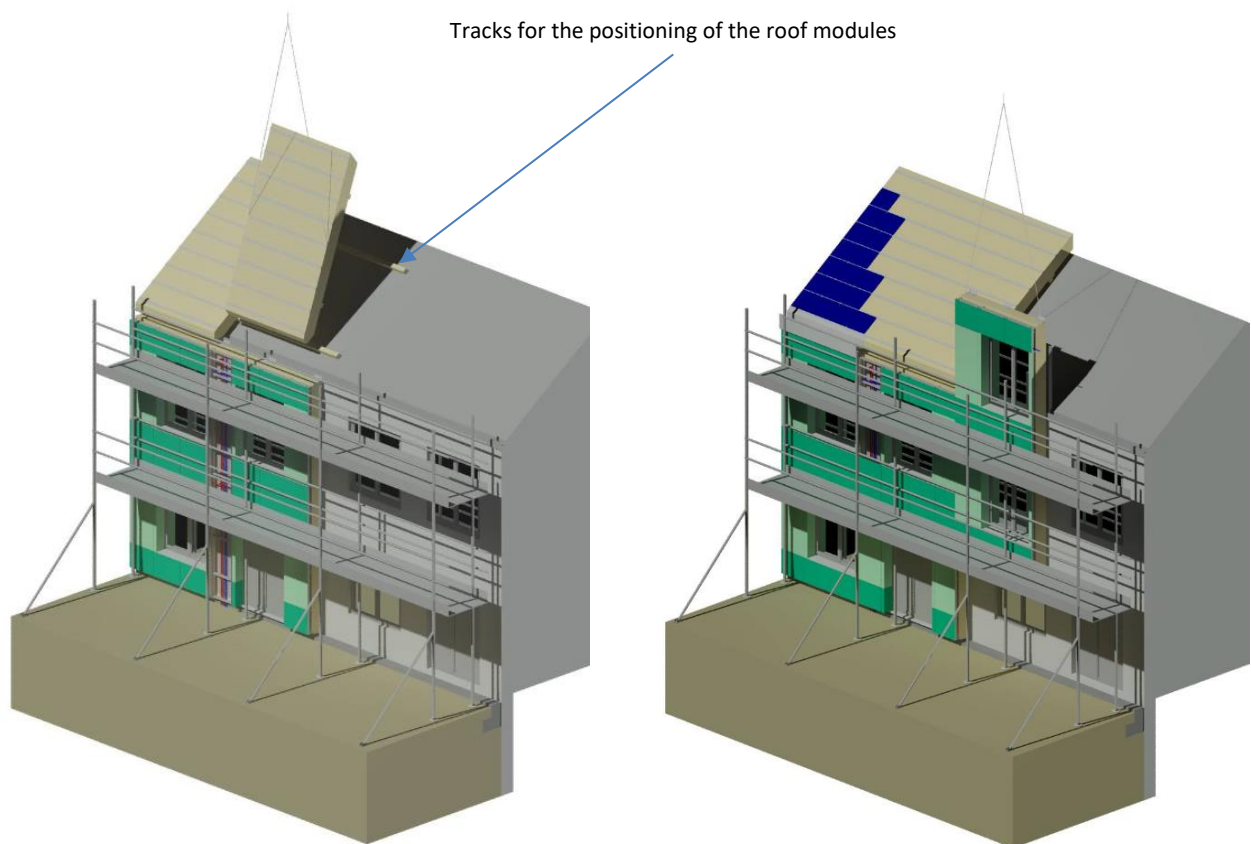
installation of the envision system. mounting of the roof modules and installation of the finishing elements
